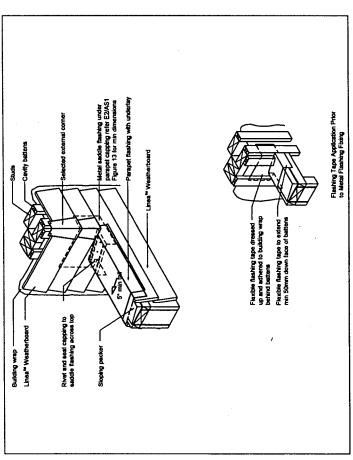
CAVITY ENCLOSED BALUSTRADE TO WALL
